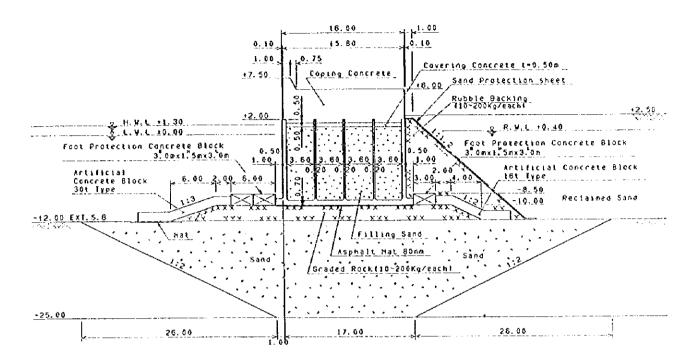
(1) Typical Cross Section of Seawall (RC Caisson)
